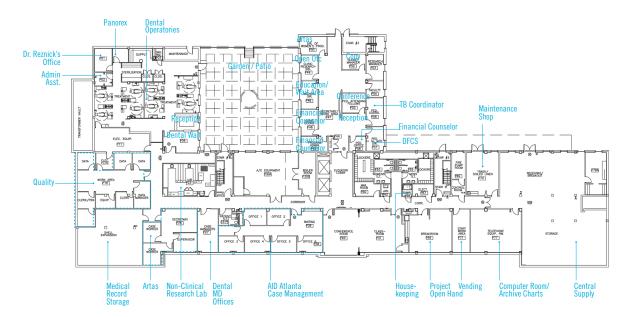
Updated floor plan for the patio level of the Ponce de Leon Center.
